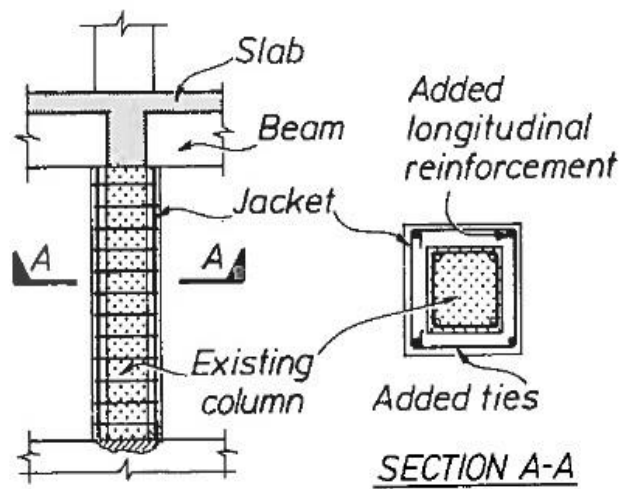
An illustration of Concrete Jacketing. (Adapted from *Repair and Strengthening of Reinforced Concrete Buildings for Seismic Resistance*, M. Rodriguez, M. Eeri, R. Park, 1991)
